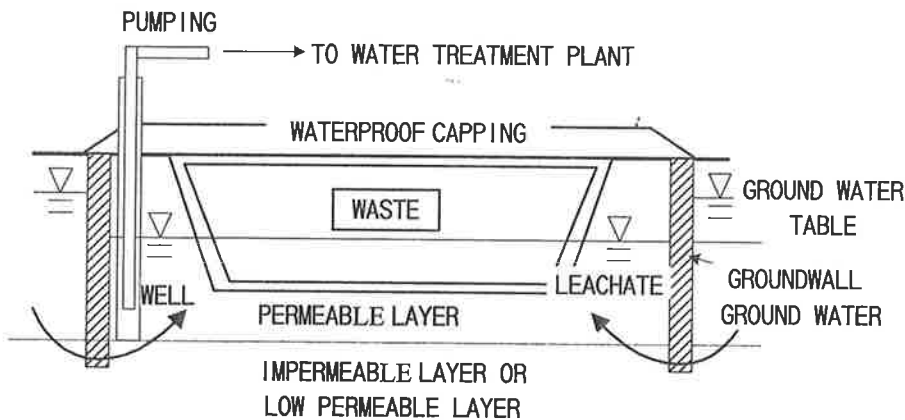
FLATLAND TYPE WITH GROUND WALL & GROUND WATER CONTROL
